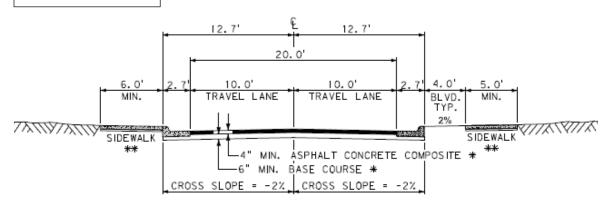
STANDARD TRIBAL RESIDENTIAL STREET TYPICAL SECTION - RURAL
